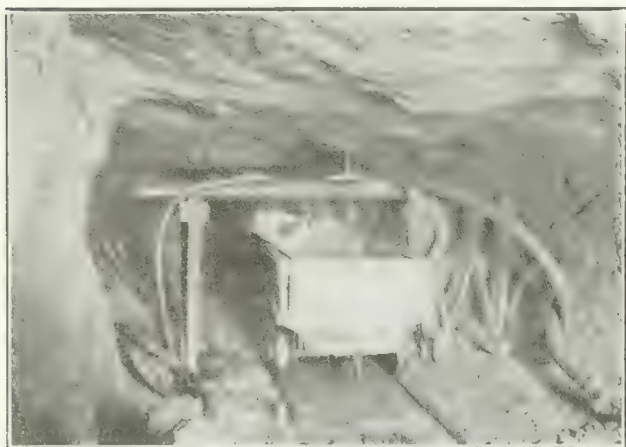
Heading Excavation, Rear End of Cantilever Beam of Drill Carriage Without Conveyer.
